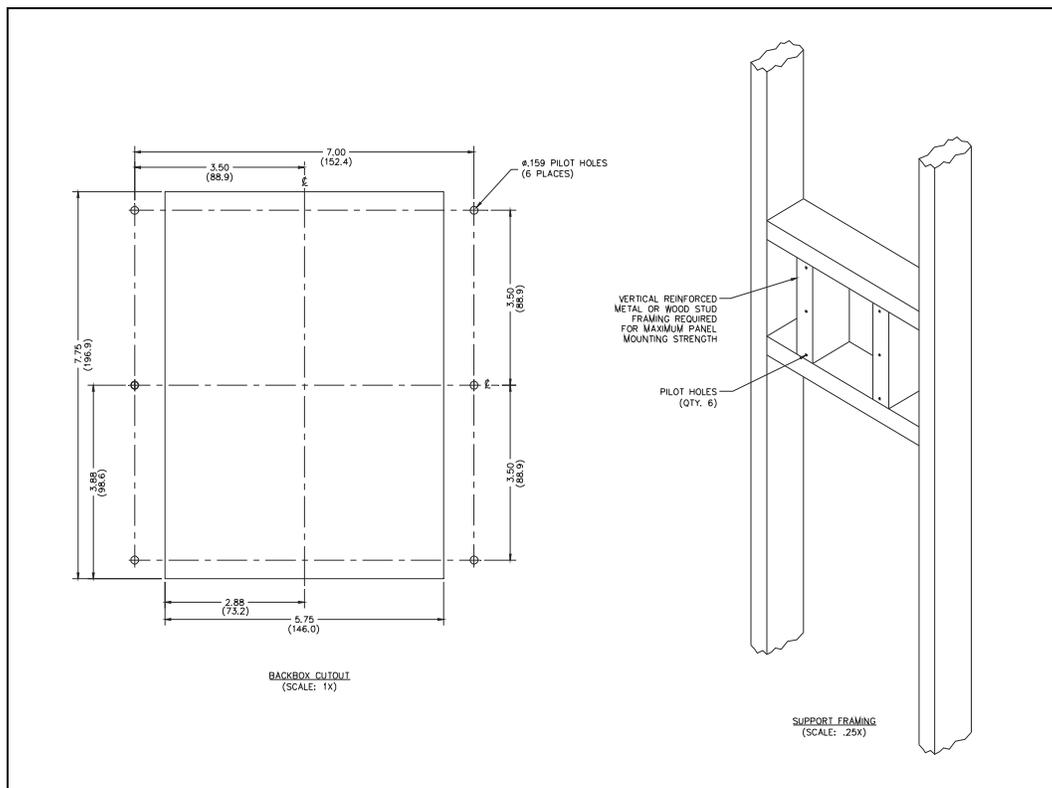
Cutout and Support Framing Detail for Model 276-002BH/-002BHAC
